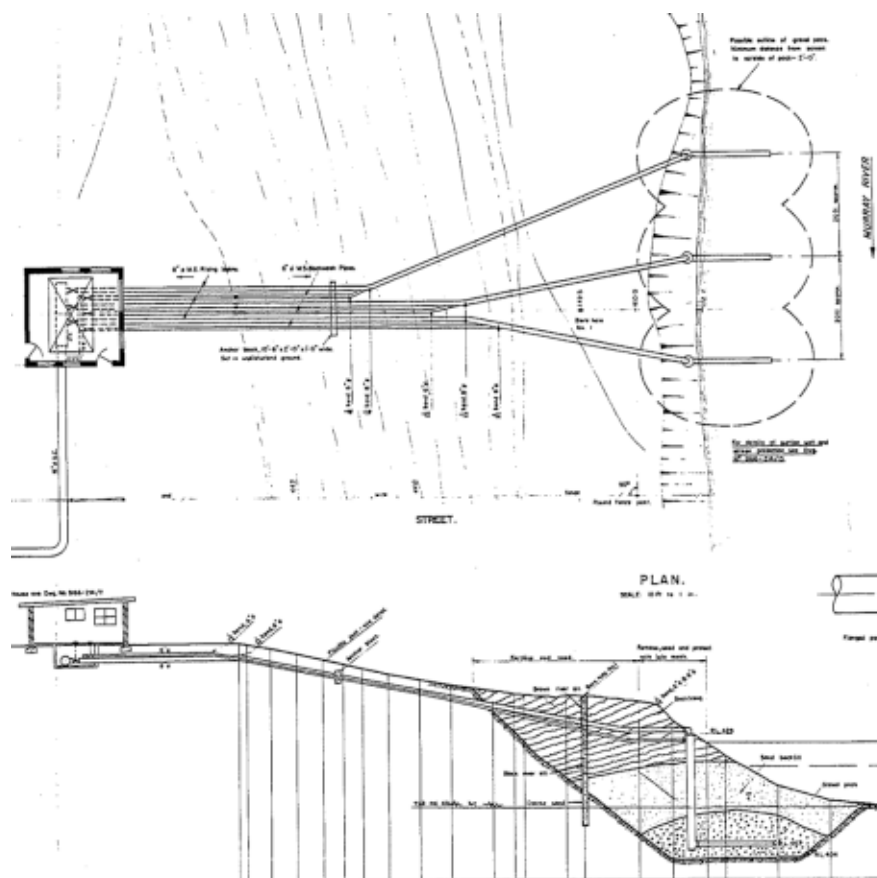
Victoria St Pump Station Plan and Cross Section
